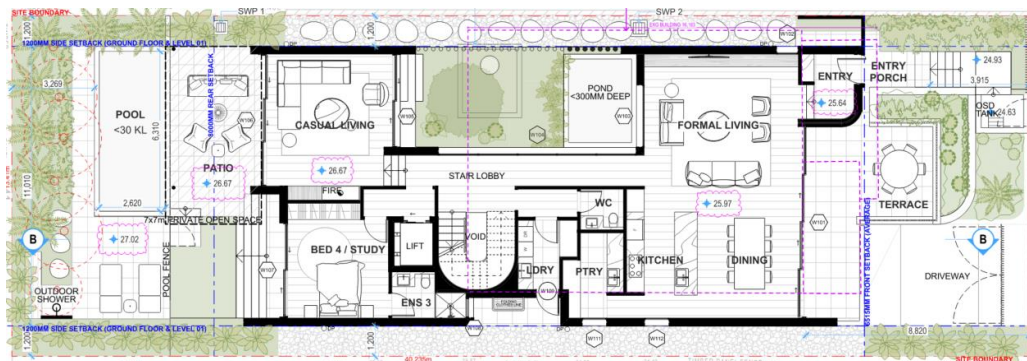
Proposed ground floor plan - 61 The Corso, Maroubra (Source: PopovBass)
